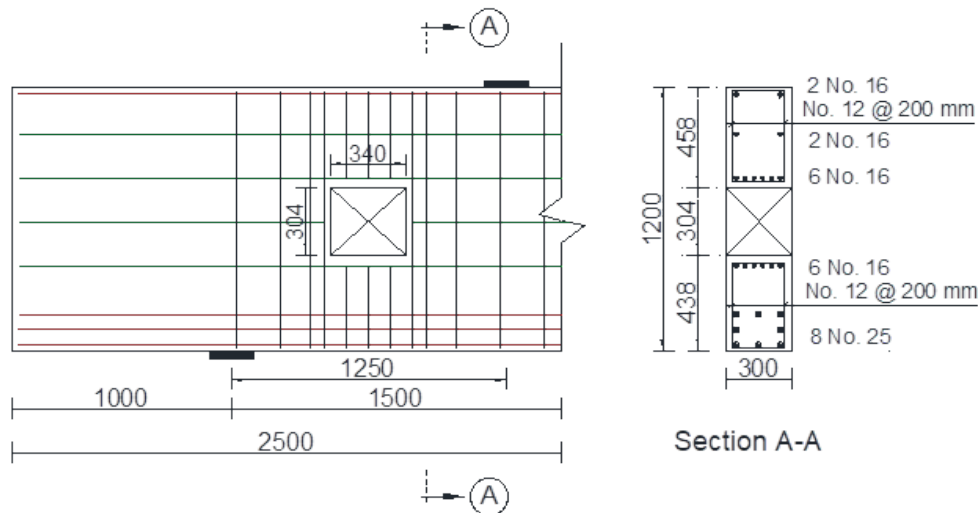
Details of DB-O3 (Dimensions are in mm)
